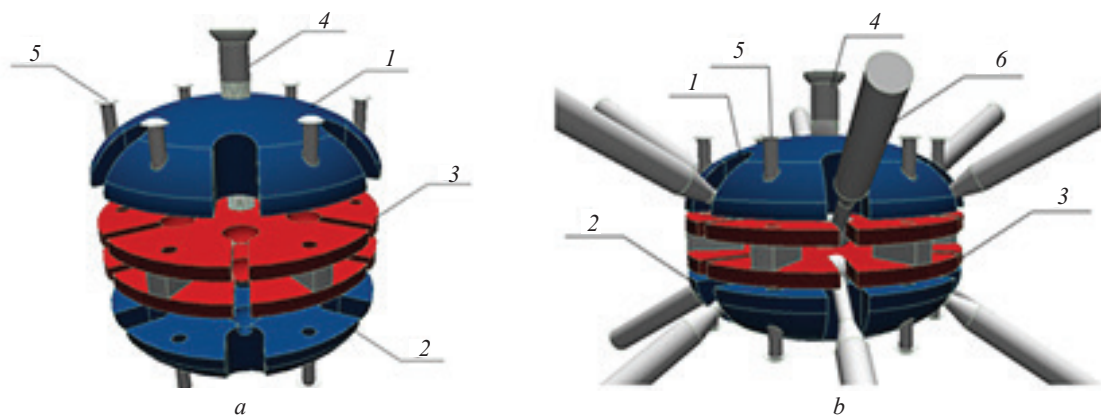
Hinged rod assembly: *a* — view of assembly without rods; *b* — view of assembly with rods; 1 — top cover; 2 — bottom cover; 3 — intermediate element; 4 — central bolt; 5 — peripheral screw; 6 — arch rod (authors' drawing)
